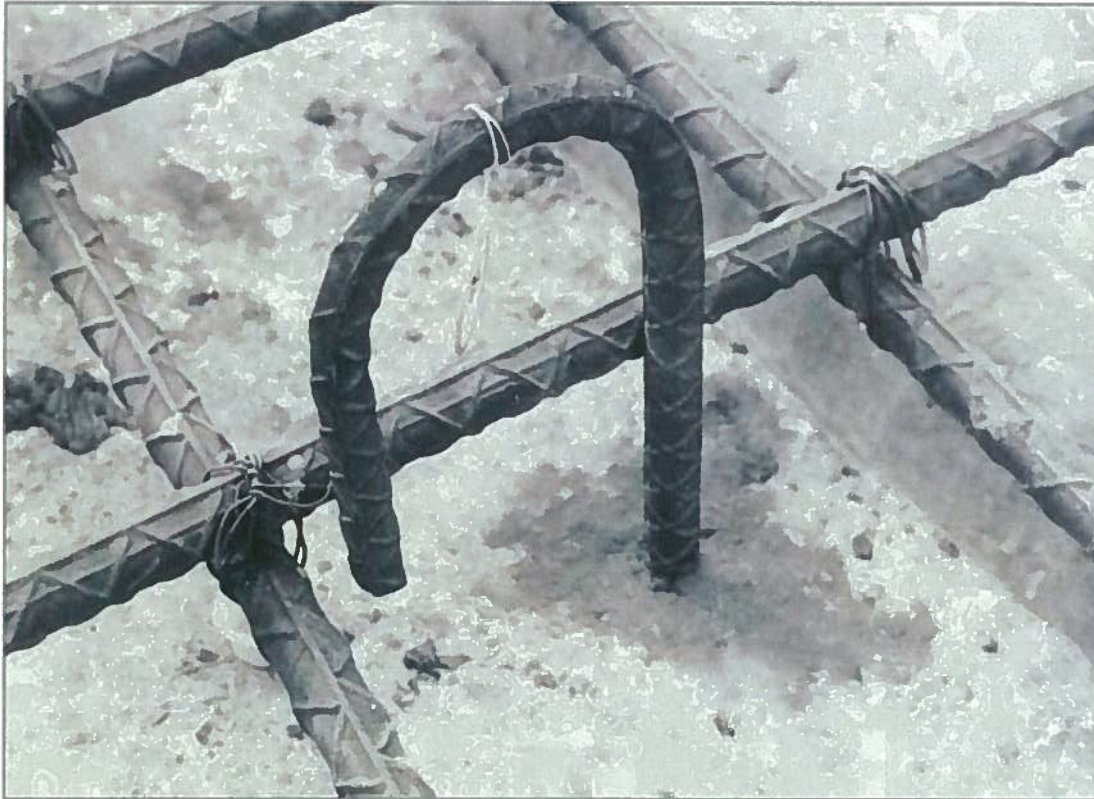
Photograph of a radial reinforcement installed as a corrective action to the CR3 Dome delamination
